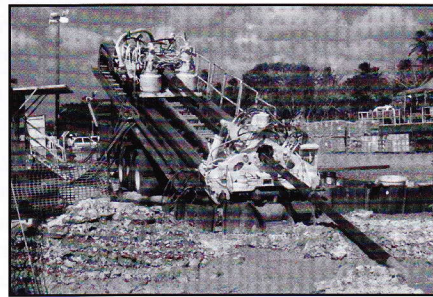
Example of large-scale horizontal directional drilling. Drill rigs of this size are normally used for long (>2000') crossings, including major river crossings. Photo courtesy of American Augers.
